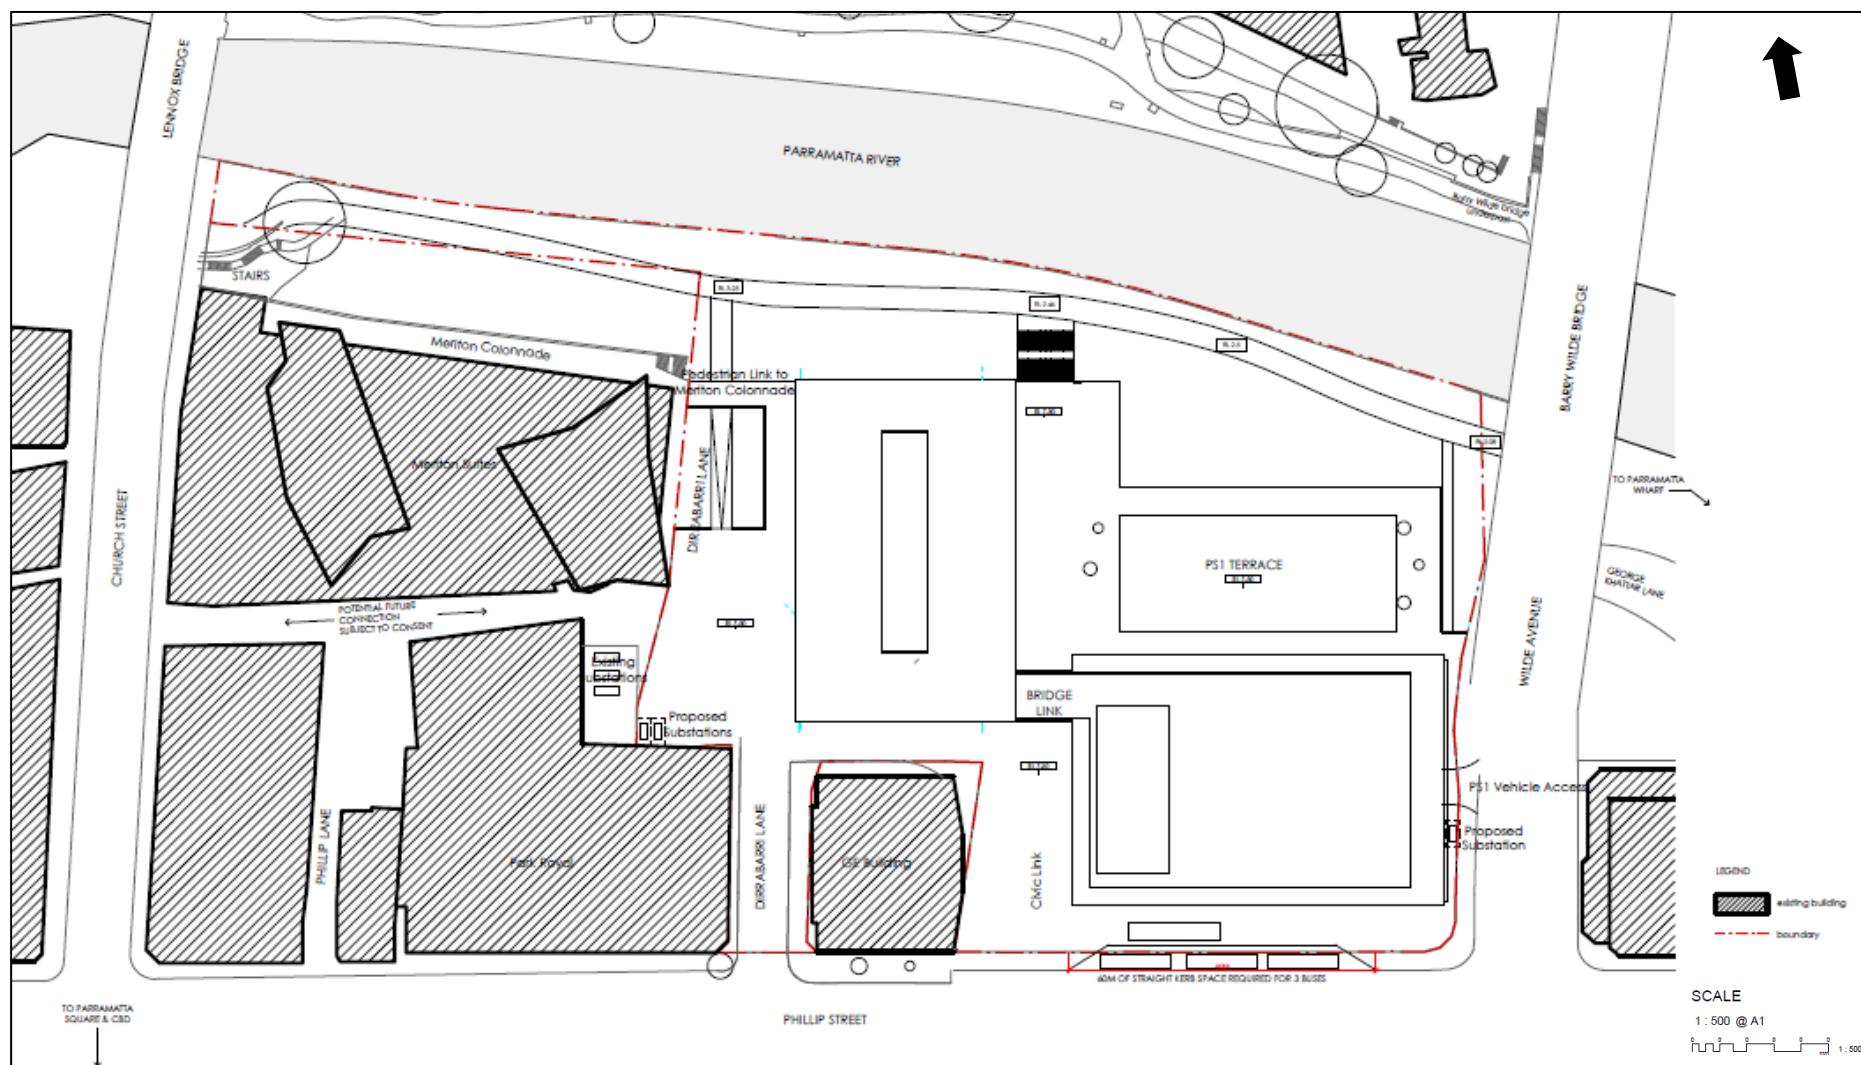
Proposed site master plan (Source: Moreau Kusunoki-Genton, 2020).
